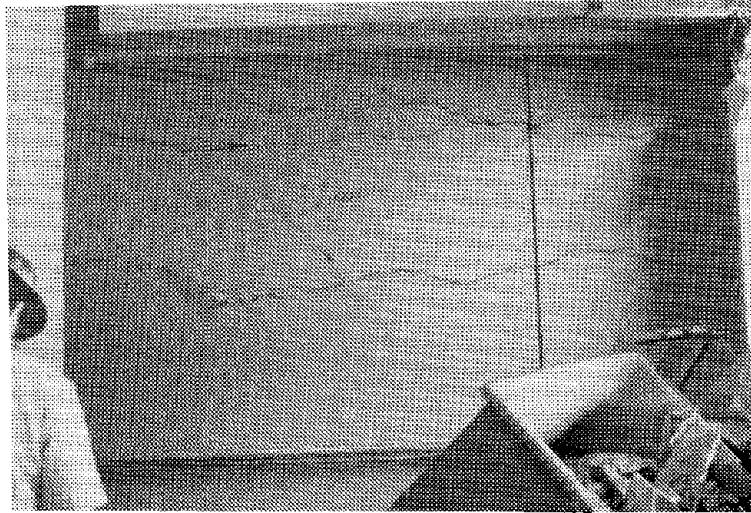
IMPACT OF MAIN BUILDING CAUSED STAIRTOWER C TO TILT TOWARDS NORTH
